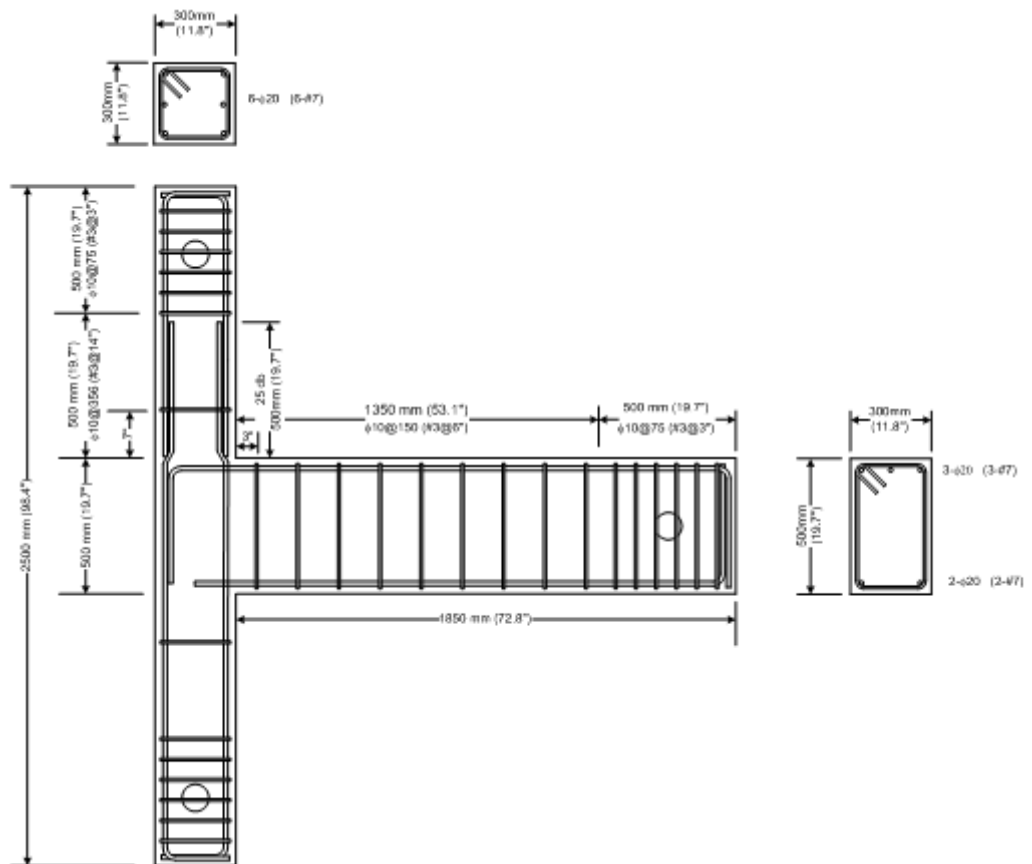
Reinforcement Details for US3-FRP1 and US3-FRP2
